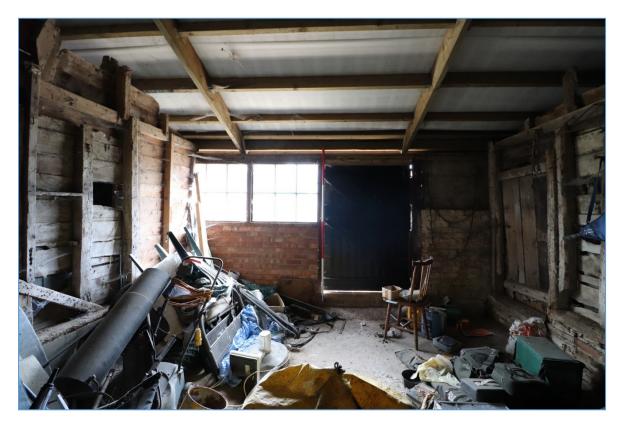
The southern elevation of the central bay of the southern lean-to, looking south, showing the later bricking up, openings and the new roof.
